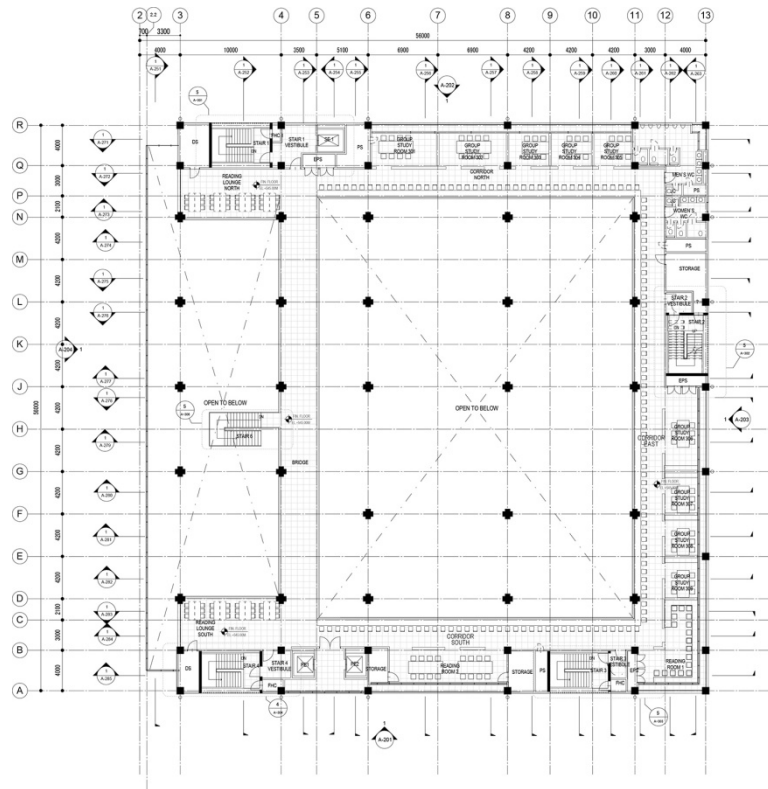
KNC 3<sup>rd</sup> Floor Plan
